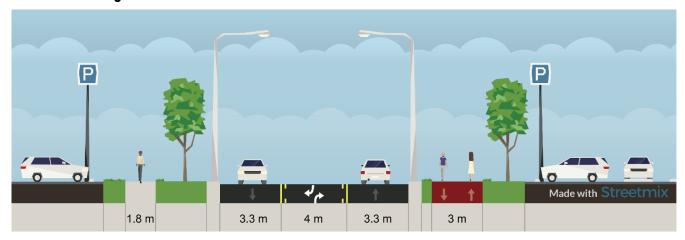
Design Alternative #3 - On-Road Buffered Bike Lanes and Sidewalks
